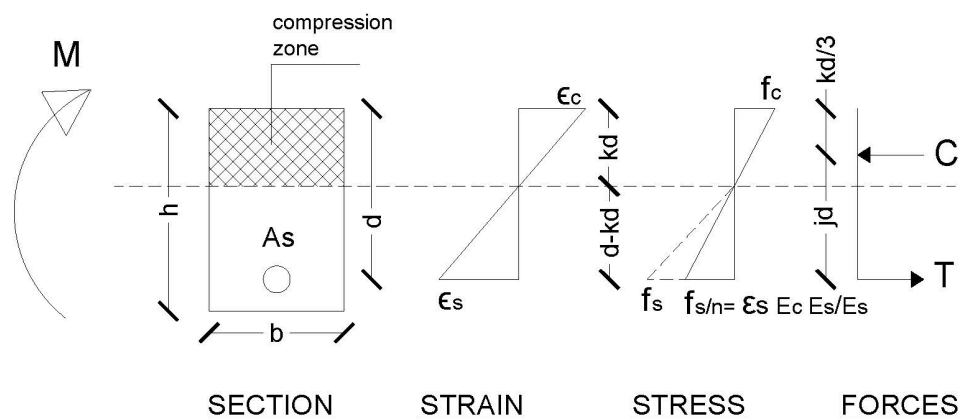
Stress, strain and forces in concrete section based on the working design method- cracked section
